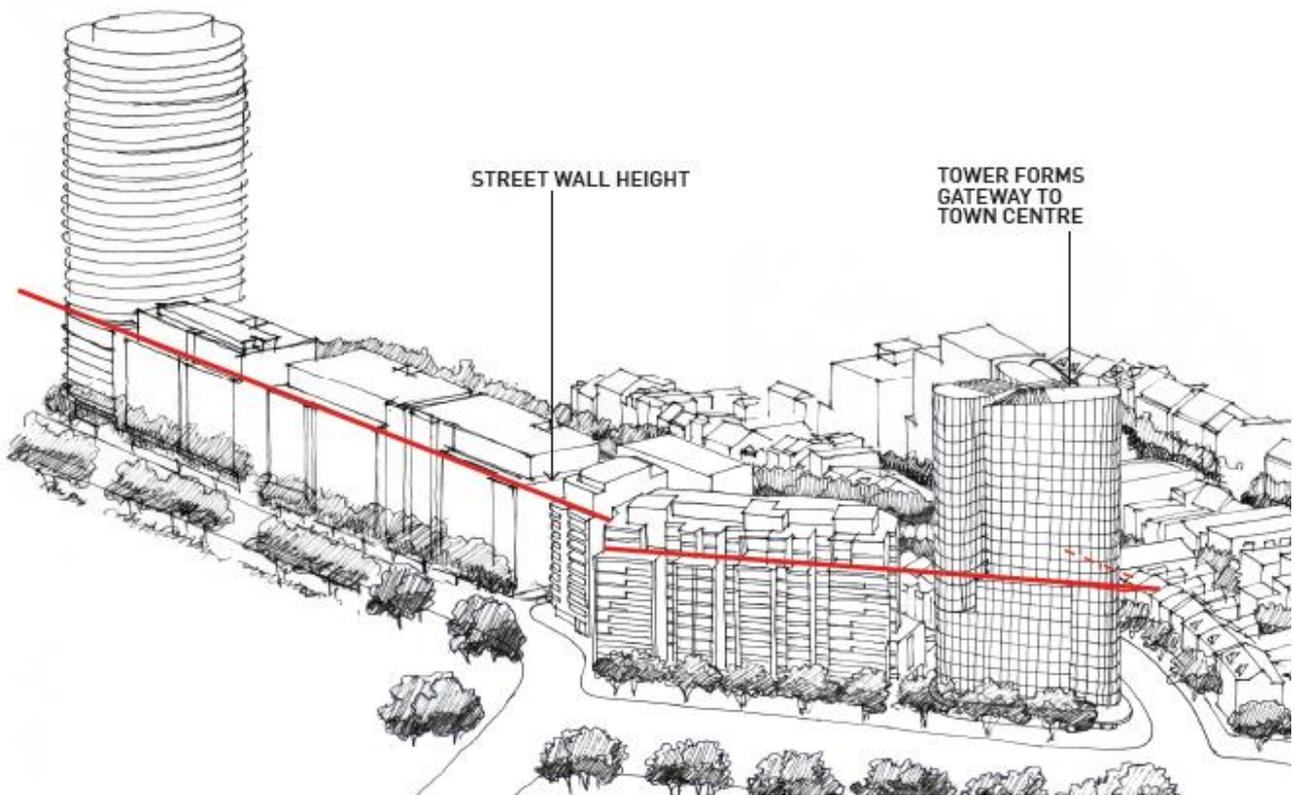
Proposed street wall height when viewed from the northern approach to the site
